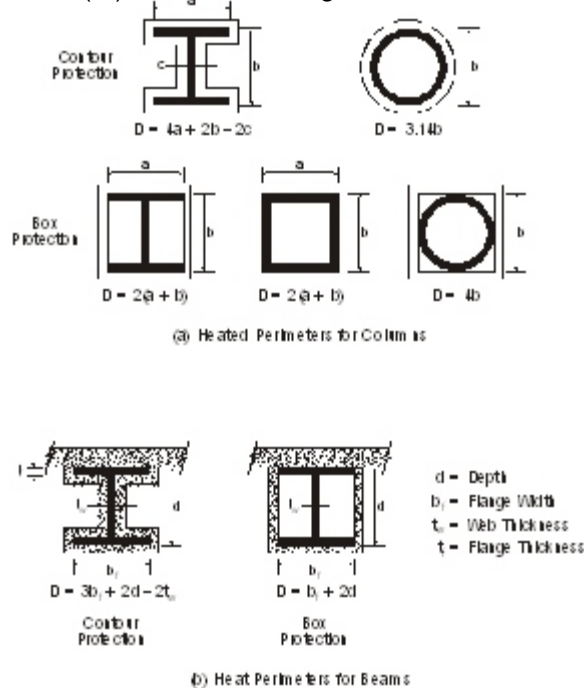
Heat Perimeters for Common Column and Beam Shapes
